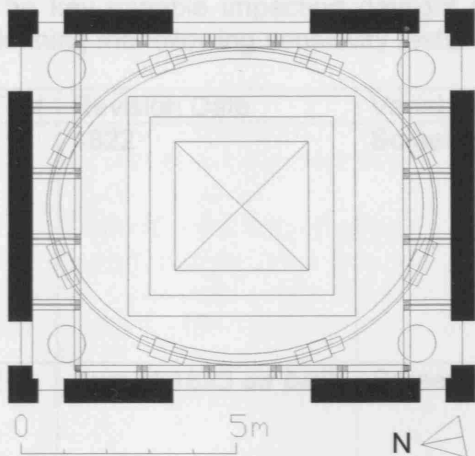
Court of Chancery Gallery Level Plan with Ceiling Plan, based on SM 3306/51
